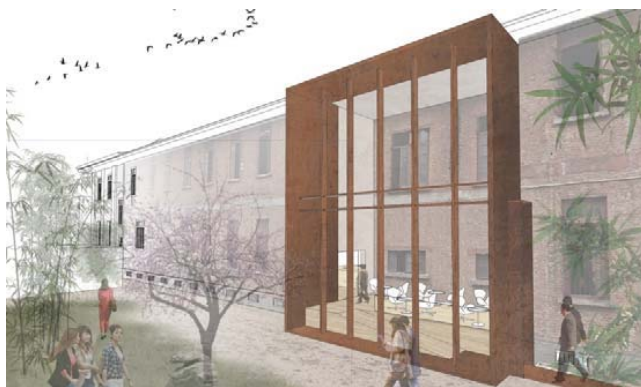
A collage rendering of the cafeteria volume addition, this architectural insertion allows the demolition of part of the 1980s North Façade unveiling portion of the original one
